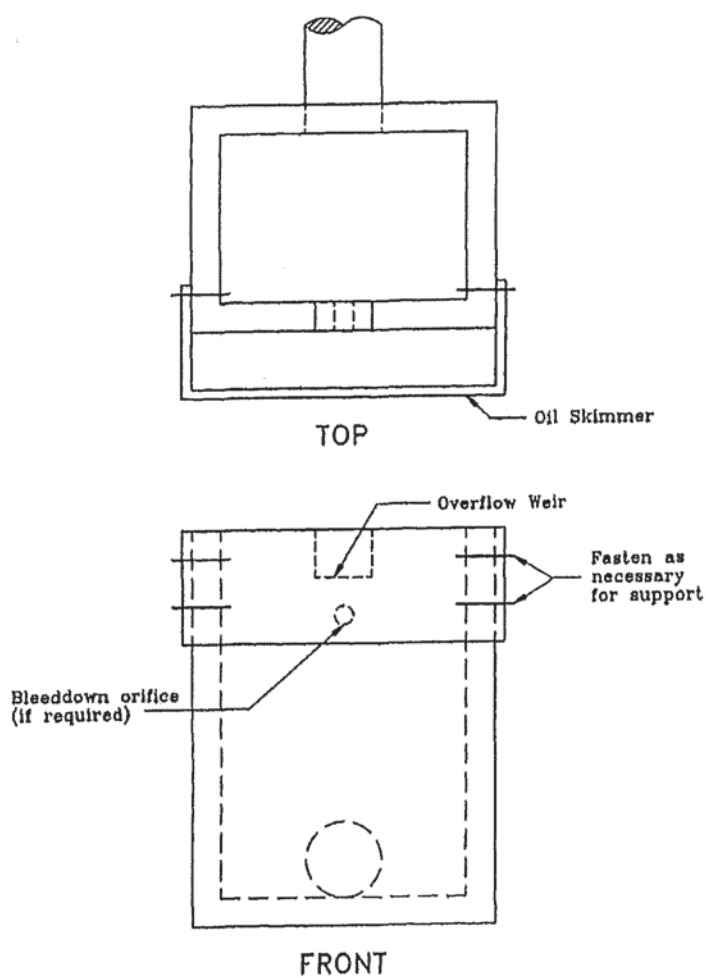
Oil Skimmer Detail for a Typical Outfall Structure (N.T.S.)
